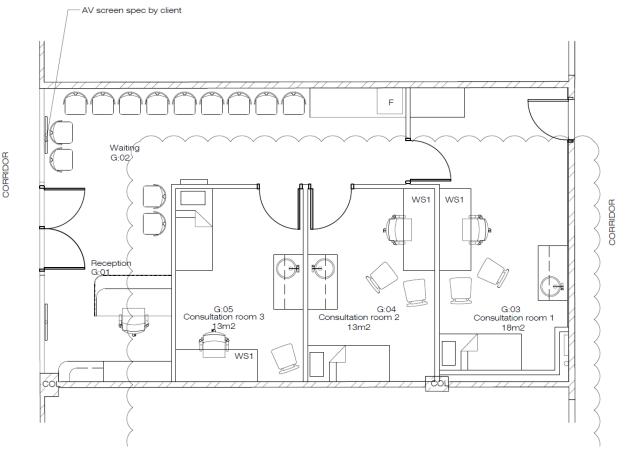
Indicative Internal Layout Plan (Source: CHROFI)
